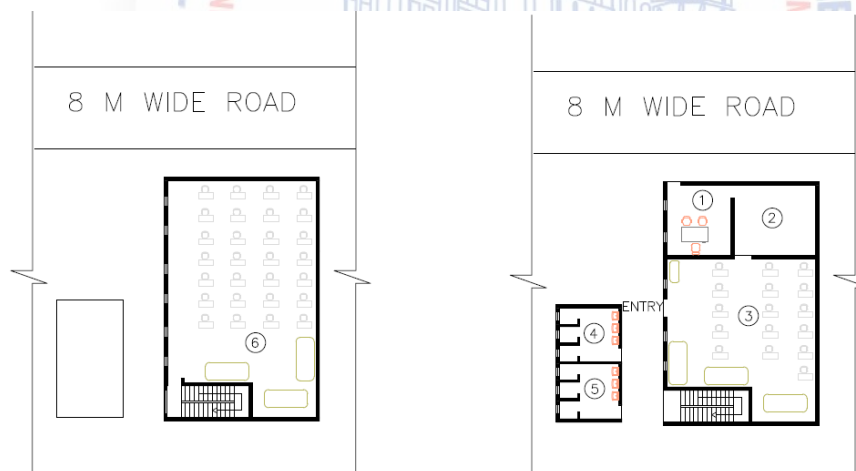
2 Schematic plan of G.FLOOR and 1st FLOOR
